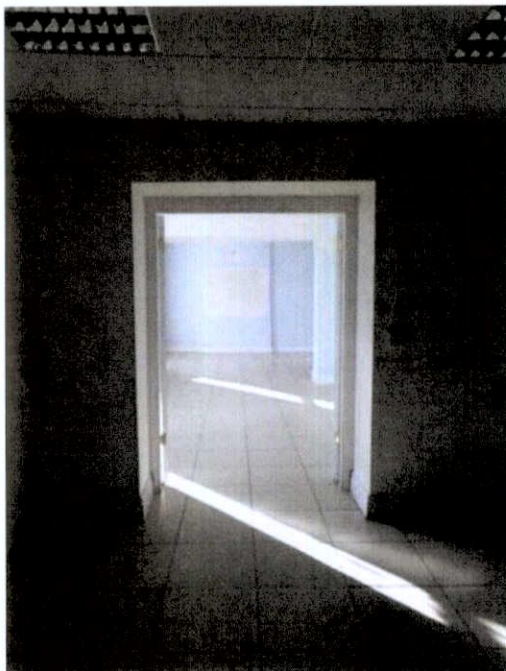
Wider view of dining room. Suspended ceilings and contemporary finishes.
